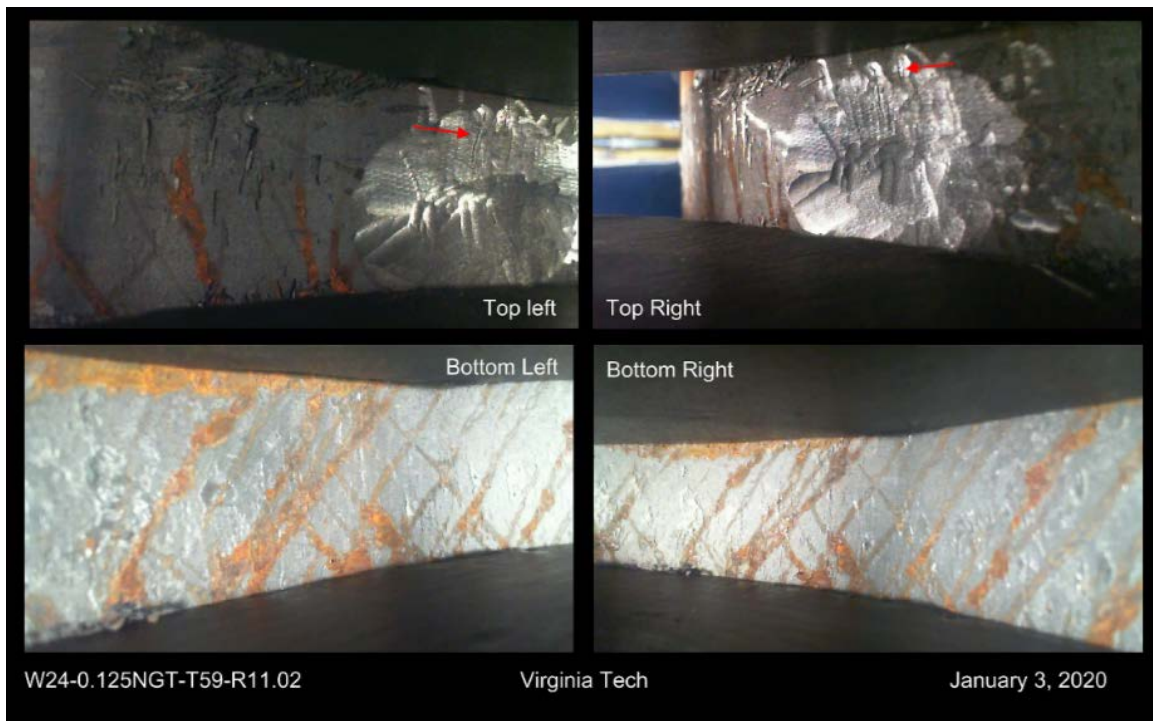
Fracture initiation of W24-0.125NGT-T59-R11.01.
